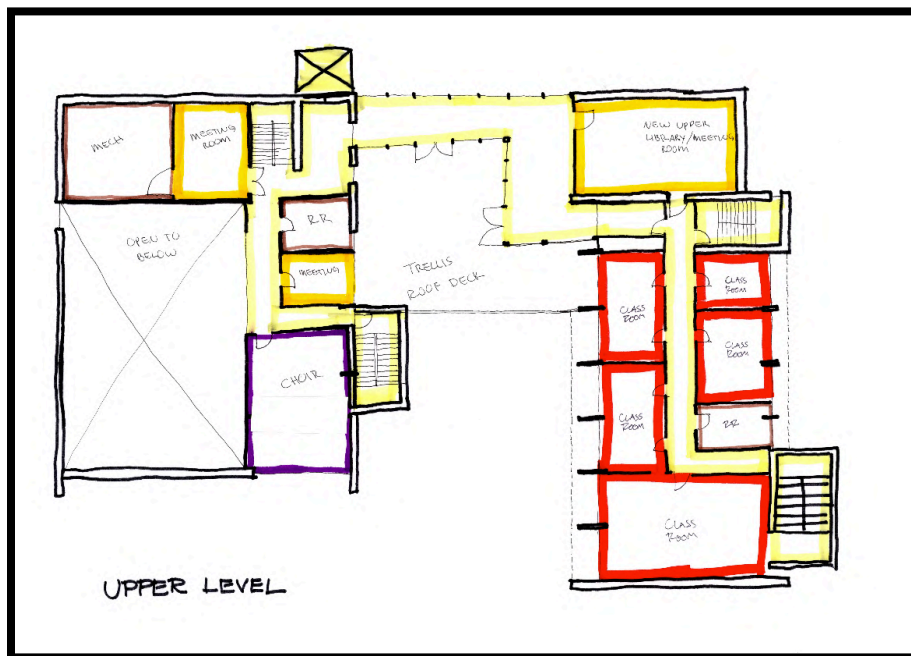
Team #2's proposed upper floor of Gregg House. In the south wing, Team #2 suggested opening up the corridor from the stairwell to the choir suite with glass to provide a visual connection to Kinsolving Hall. In this image, Team #2 also suggests a corridor that bridges the roof deck, including a new stairwell that could provide a direct connection from a roof terrace to the lower-level courtyard. A new stairwell on the northside of Gregg House could provide separate, controlled access to classrooms or leasable office space (outlined in red) on the third floor.
